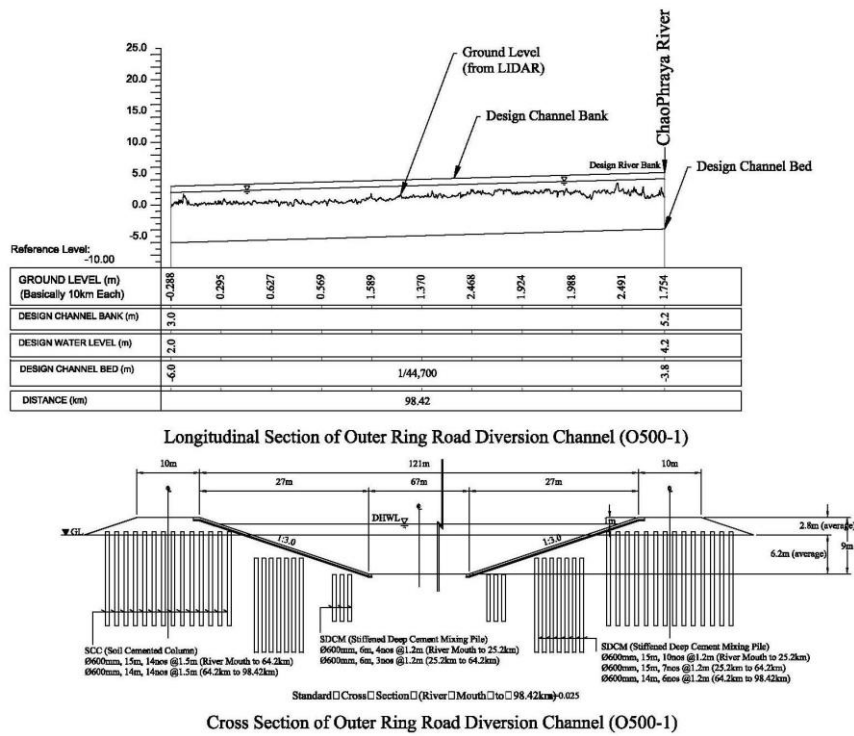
Profile and Cross Section of Outer Ring Road Diversion Channel (O500-1)
